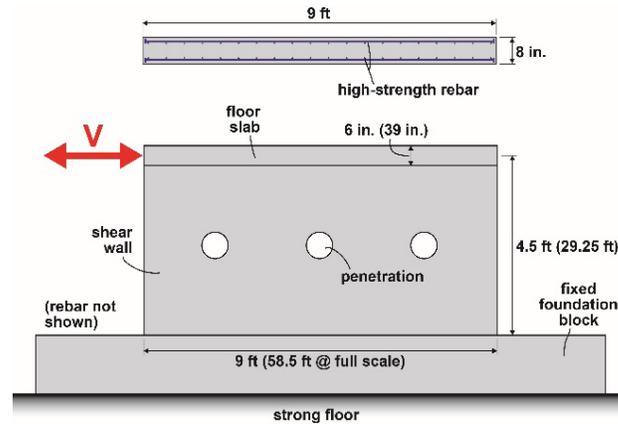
Preliminary cross-section (top) and elevation (bottom) views of reduced-scale capstone shear wall specimens.
